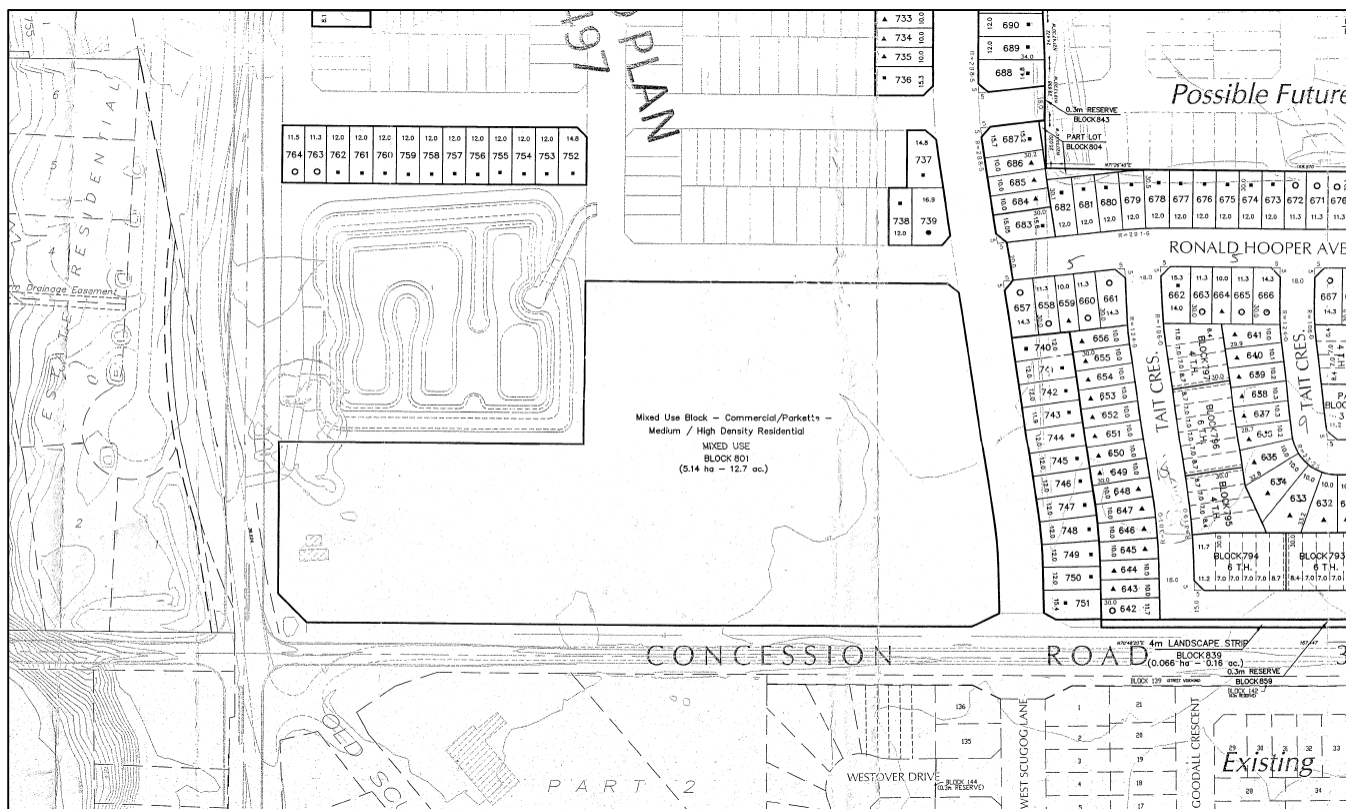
Latest Draft Approved Plan of Subdivision showing Block 801
